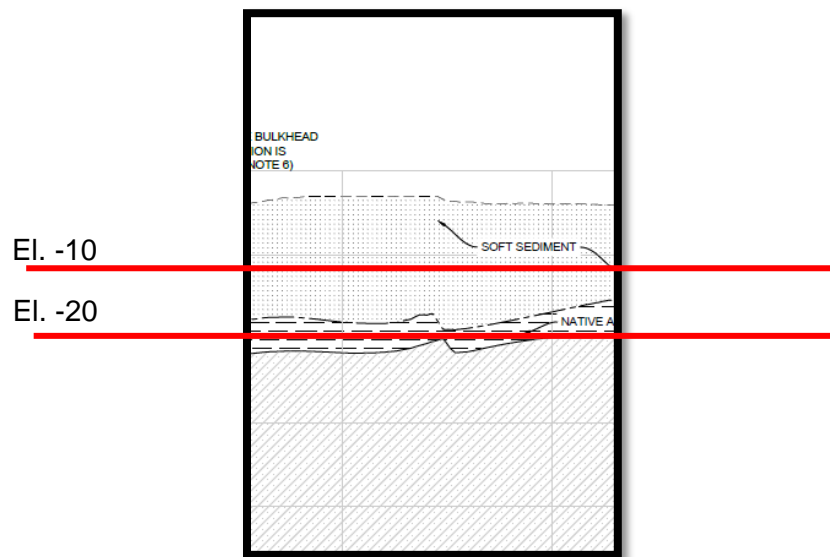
Douglass Street (West) Canal Side Profile (See Reference 4 Sheet DR-1)
